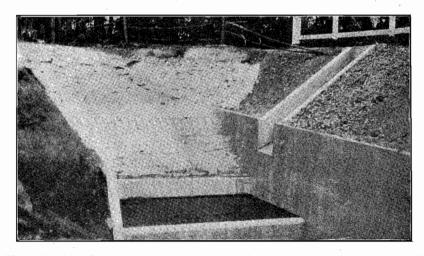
Site as above with concrete drop structure and retaining wall.
